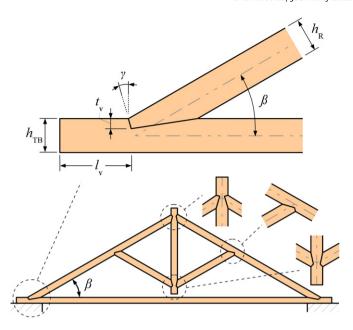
Traditional roof truss and rafter and the tie beam connection.
